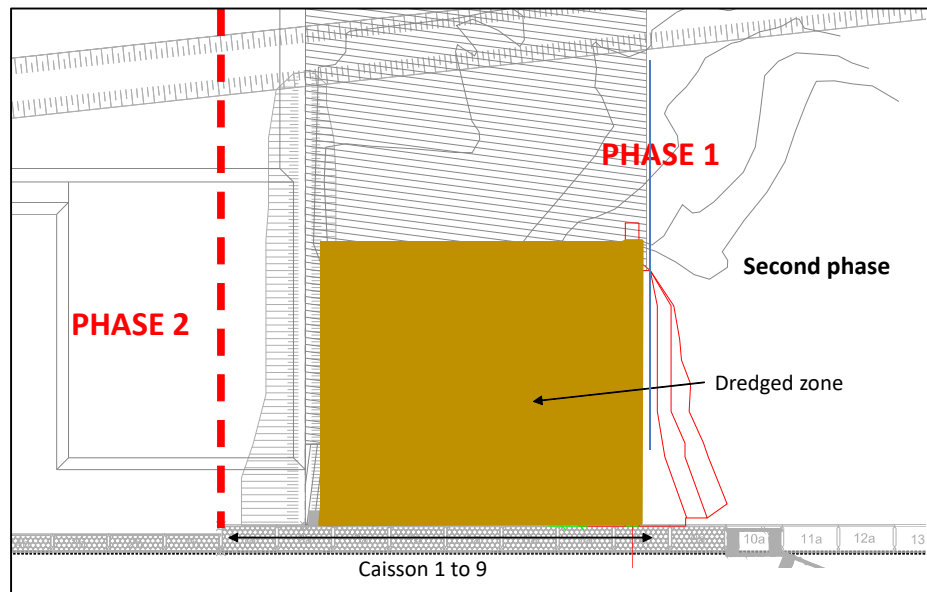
Plan view of Stage 1 of Phase 1 reconstruction, APB (2009).
